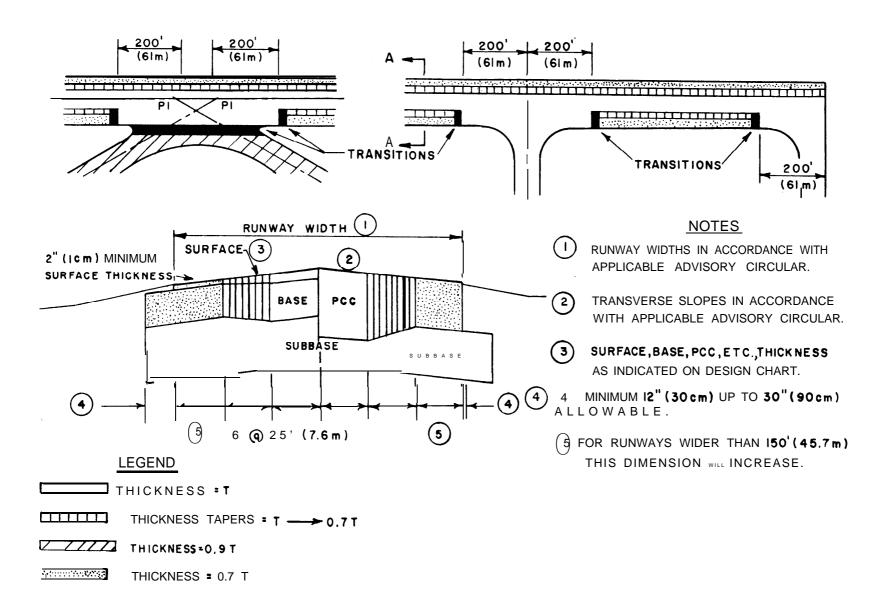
TYPICAL PLAN AND CROSS SECTION FOR RUNWAY PAVEMENT
